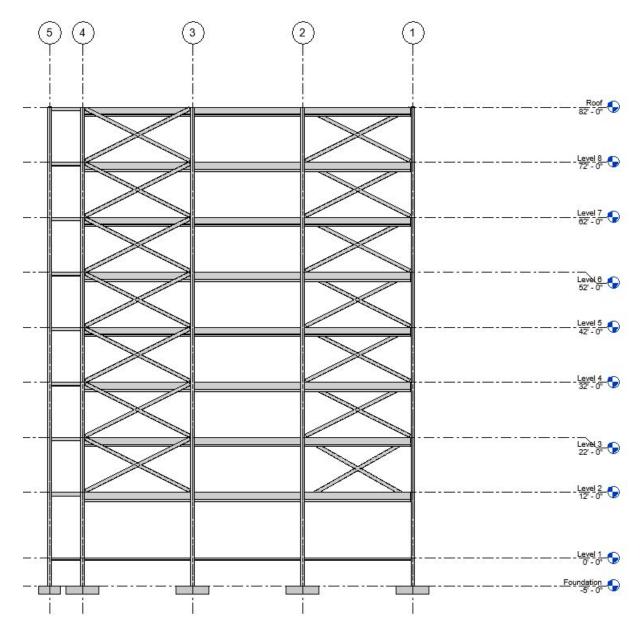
Steel Architectural Model North Elevation View
